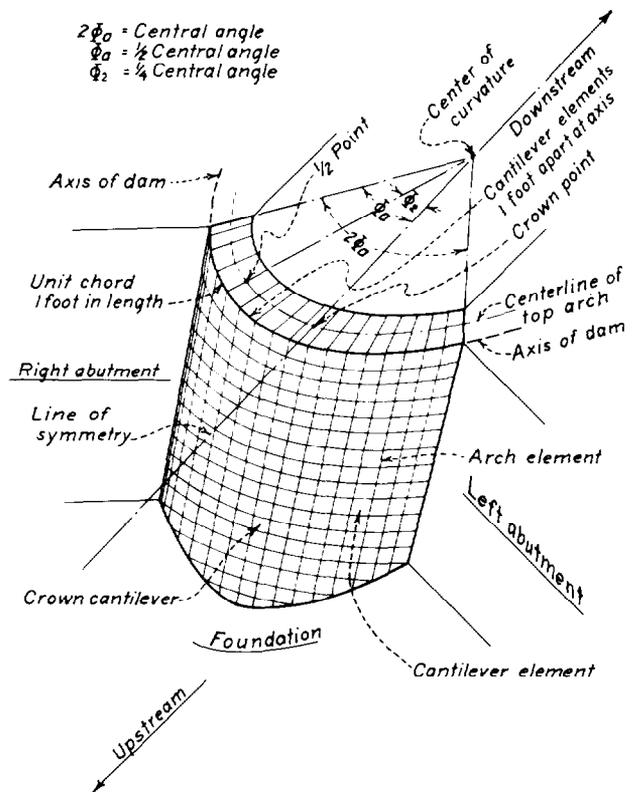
Arch and cantilever elements of a constant-radius symmetrical arch dam. 288-D-138
